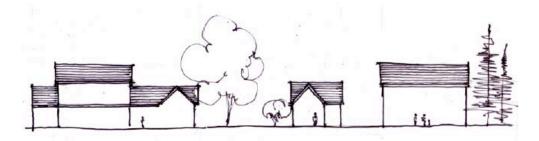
Elevation illustrating varied building heights which is recommended in the rural landscape because it achieves visual interest and enhances site build-out capacity.
